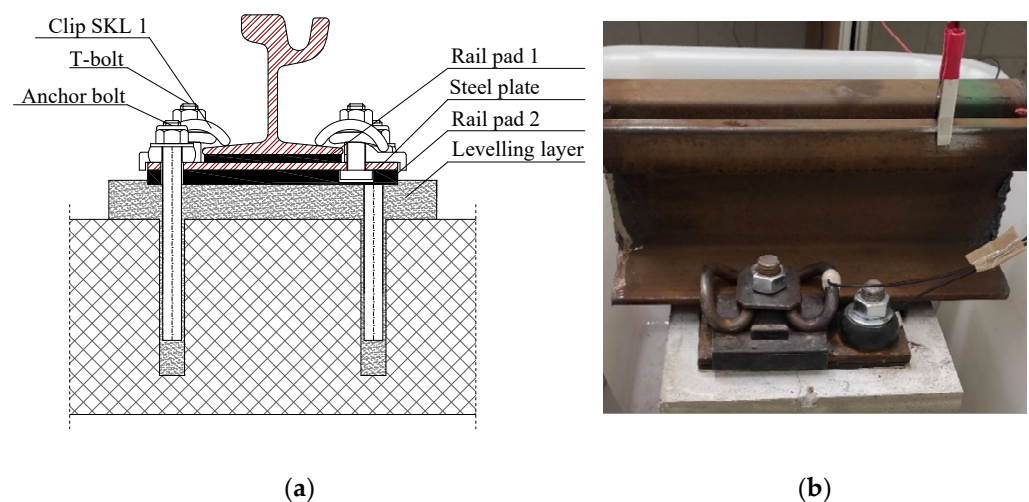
(a) Cross section of an indirect fastening system. (b) Real-scale sample of the indirect fastening system used in the tram track infrastructure in Zagreb, Croatia.
